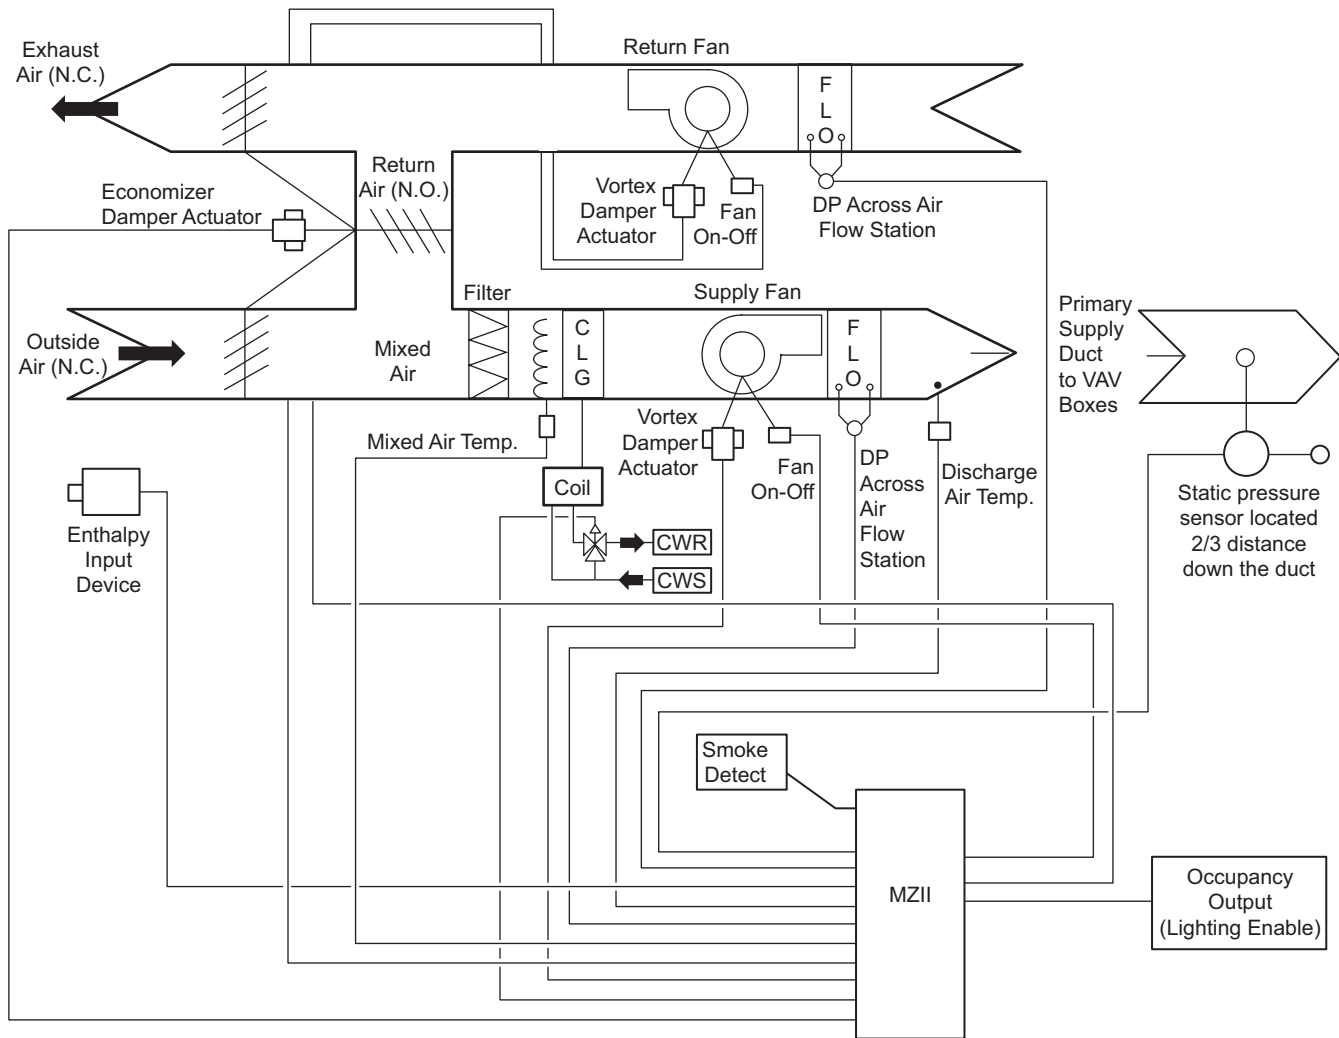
MZII Control Schematic of a Typical Fan Tracking VAV Air Handling System.
